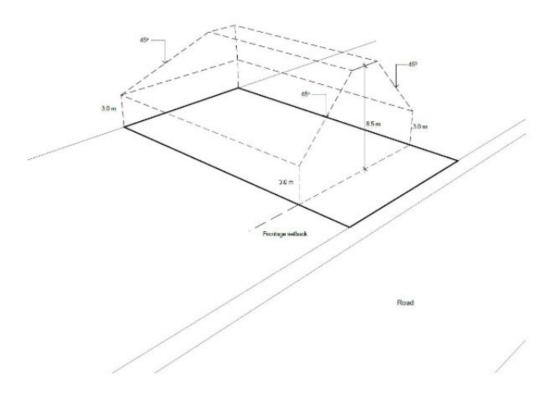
Building envelope for corner lots as required by clause F5.4.2 A3(a) and clause F5.5.1 A2(a)
